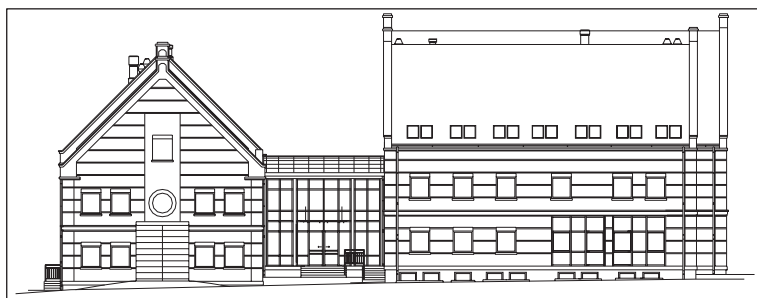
The west wall elevation. Author: M. ZAGROBA
